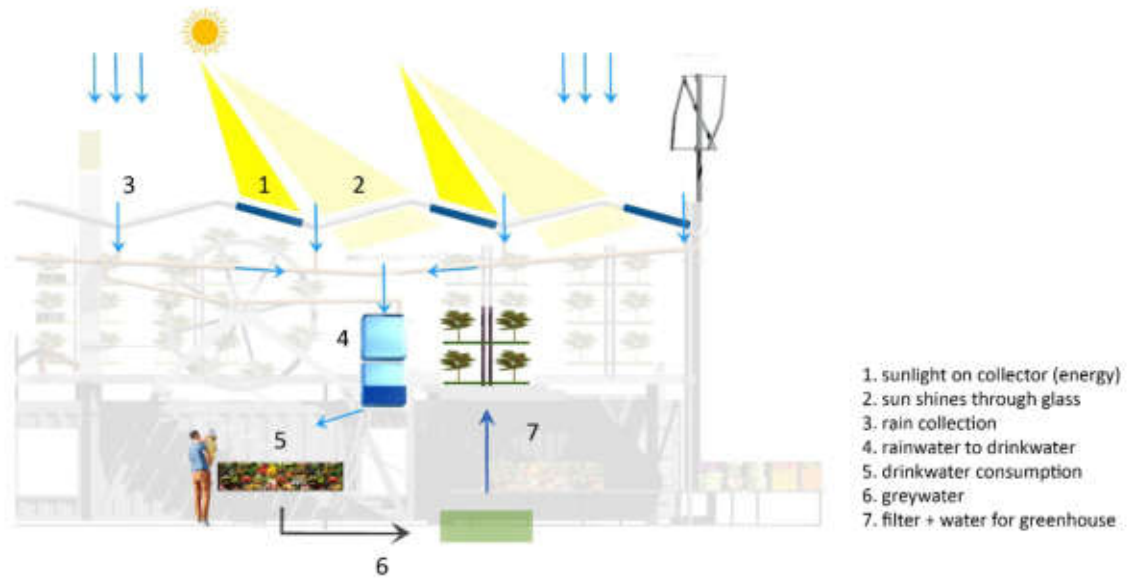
Multi roof: water and energy harvesting in glass roofs above a green roof
